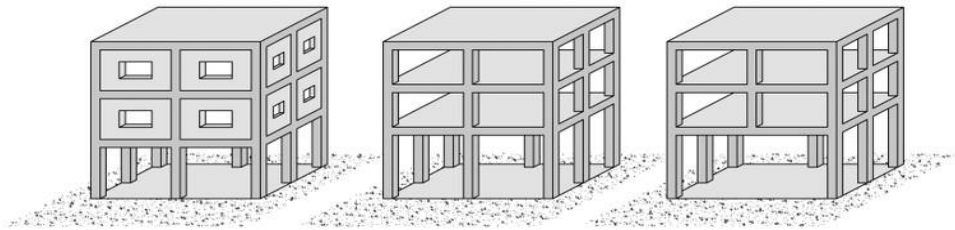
From left to right: stiff and strong upper floors due to masonry infills; columns in one storey longer than those above and soft storey caused by discontinuous column
